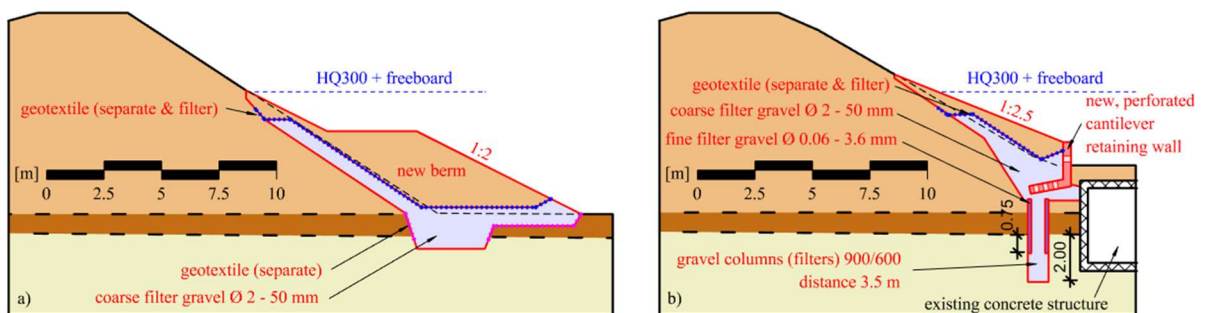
Typical cross-section of the river Rhine remediation measures: a) usually carried out restoration with ballast filter and pressure relief trench; b) completed levee reconstruction with pressure relief gravel columns, ballast filter and retaining wall.
